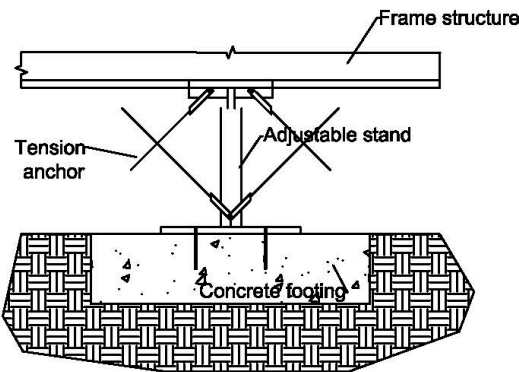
A footing system with telescoping arm and a spade anchor deadman.
